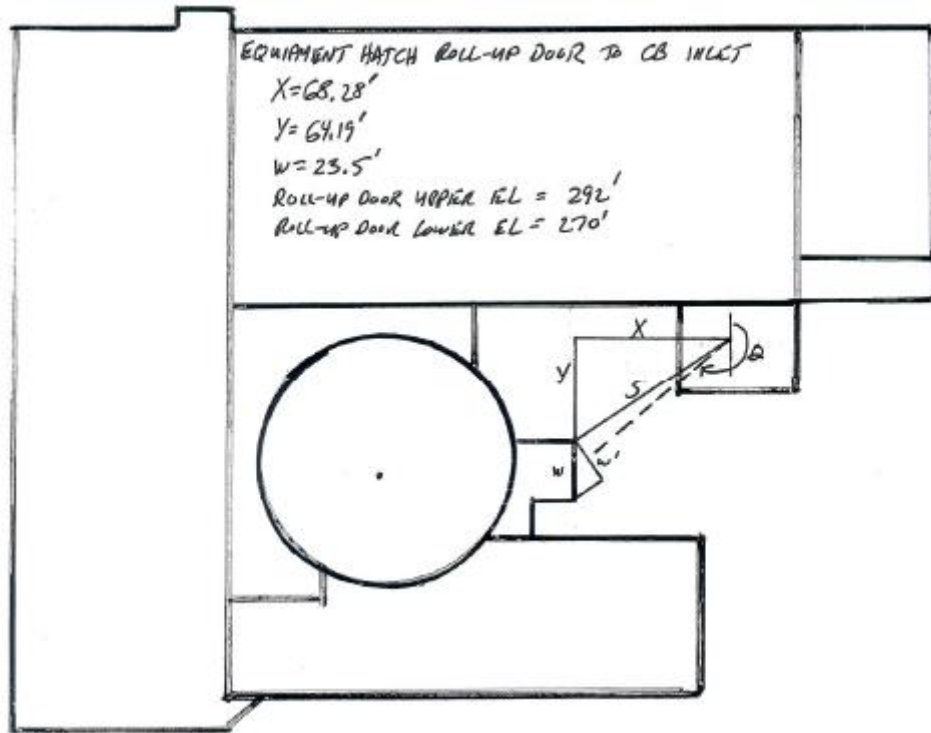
Equipment Hatch Roll-Up Door (Area Source) to Control Room Inlet
